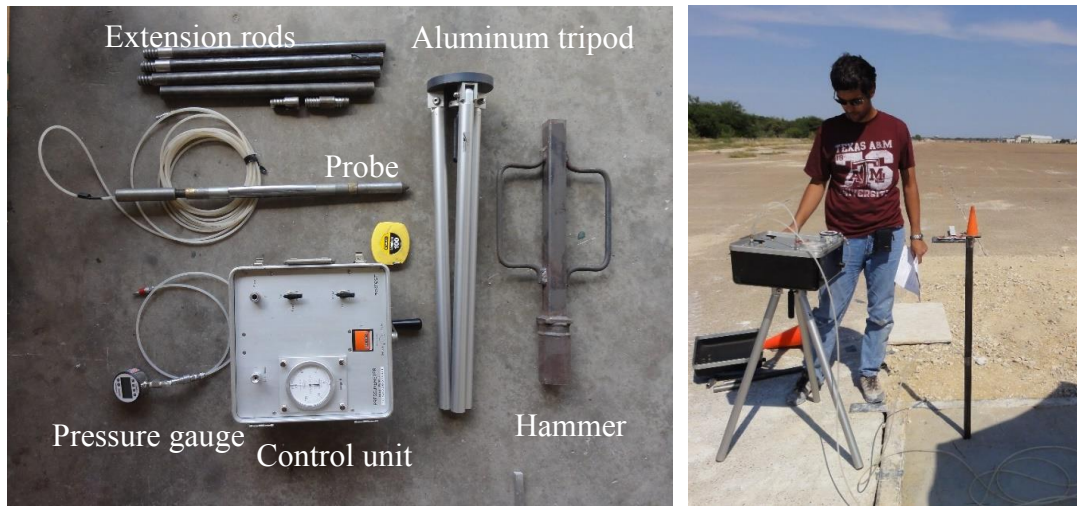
Pencil pressuremeter equipment and the test in the field
